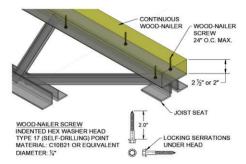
Wood-nailer Attachment to Steel Joist [2]
